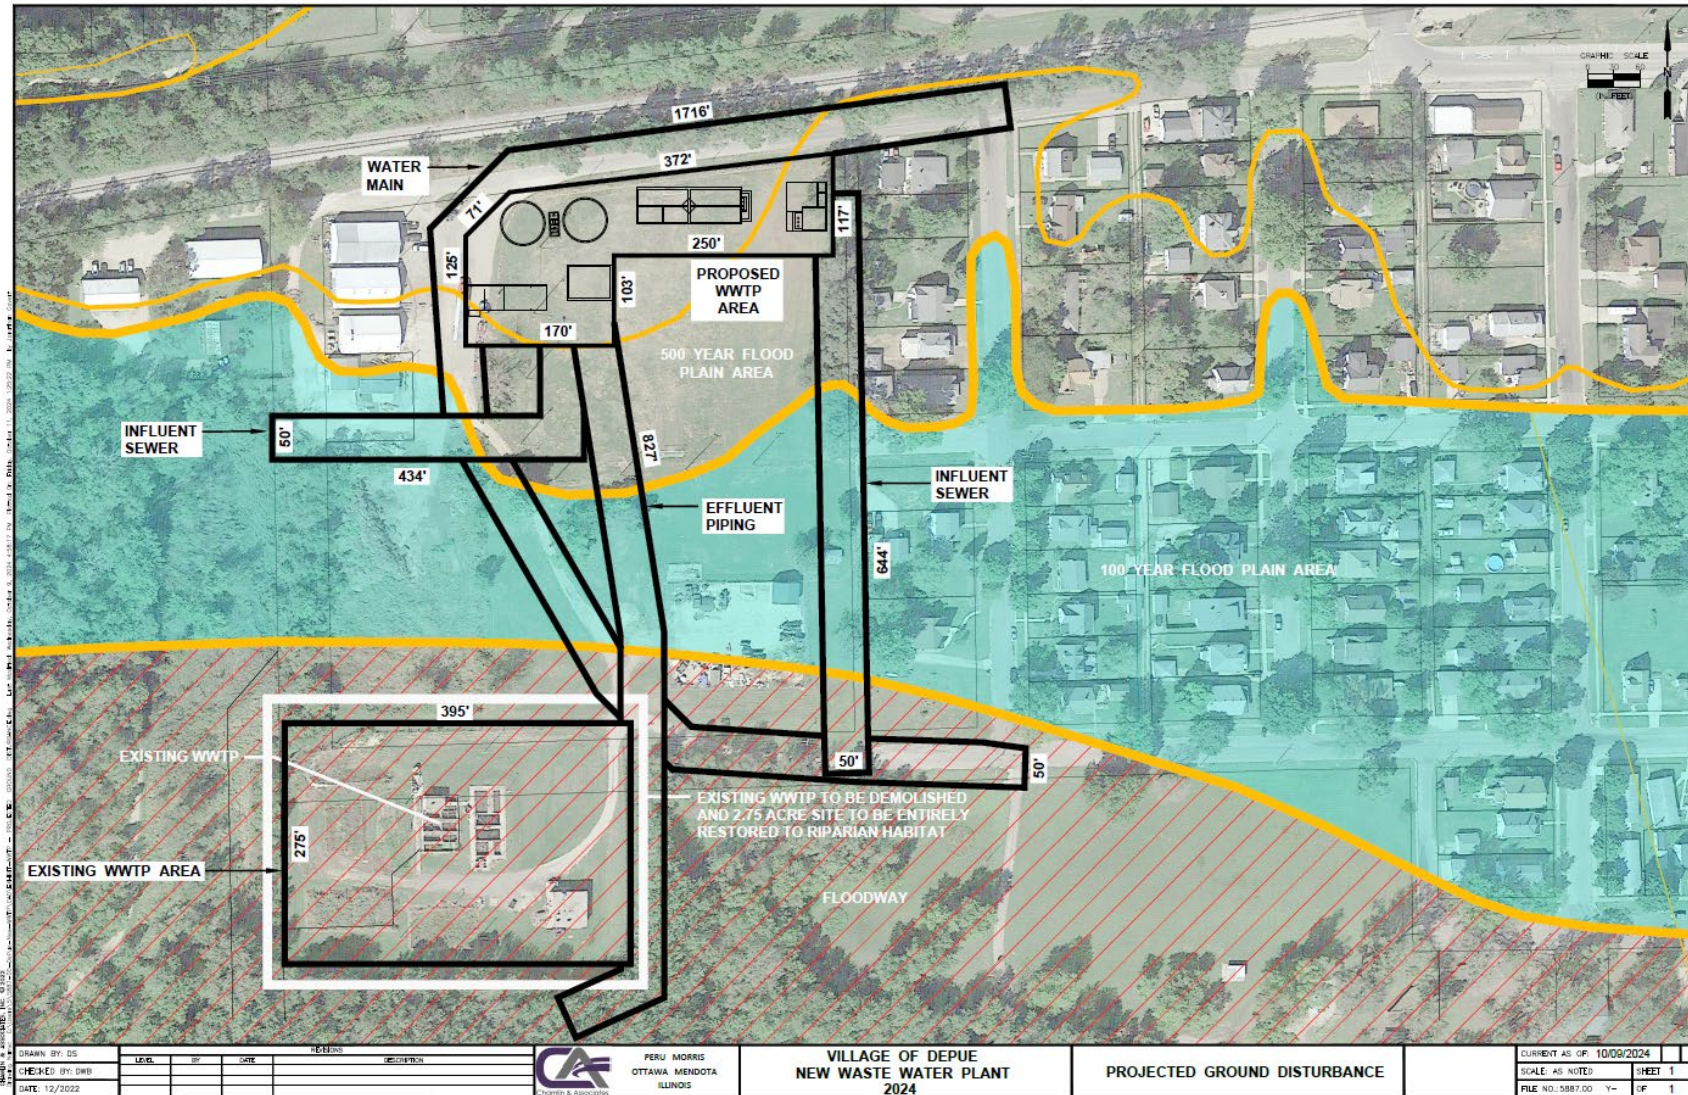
DePue WWTP Project Proposed Construction Plans Layout
